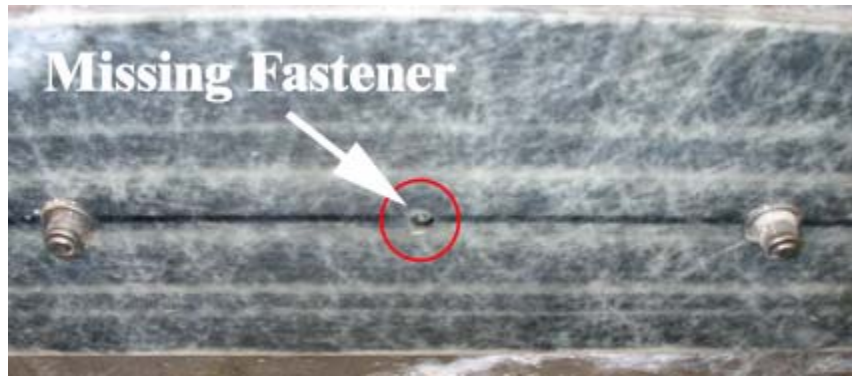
Missing fastener due to pocket of poor consolidation in the concrete
